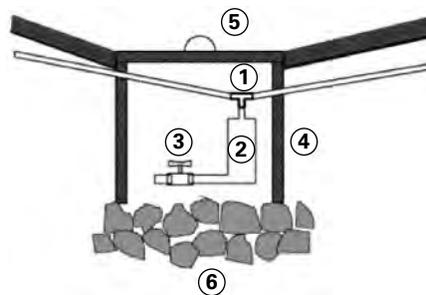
Manual water trap: (1) T-joint, (2) buffer storage for condensed water, (3) manual tap, (4) casing, (5) concrete lid, (6) drainage [3].
